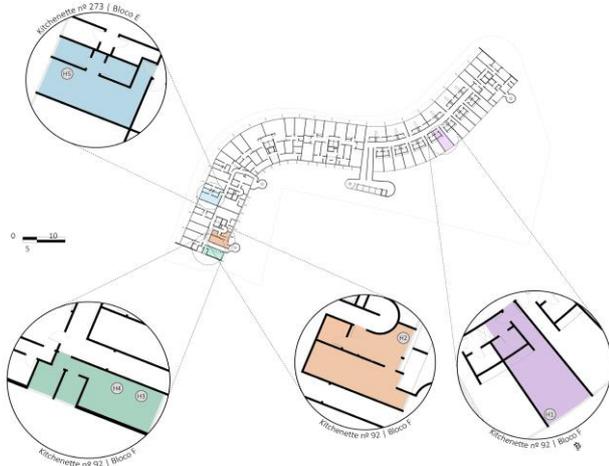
Plan of the typical floor of the COPAN building, with highlighting the plans of the four case studies studio flats.
